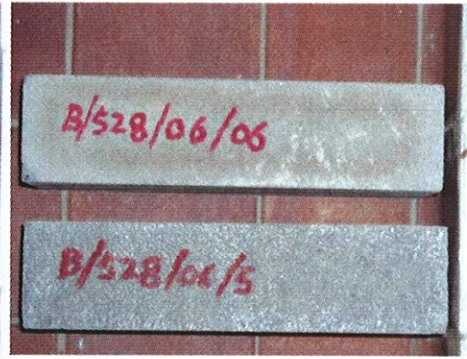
Shiraflo SC60 – dark grey fire bricks, Cremators Room and Storage Room
